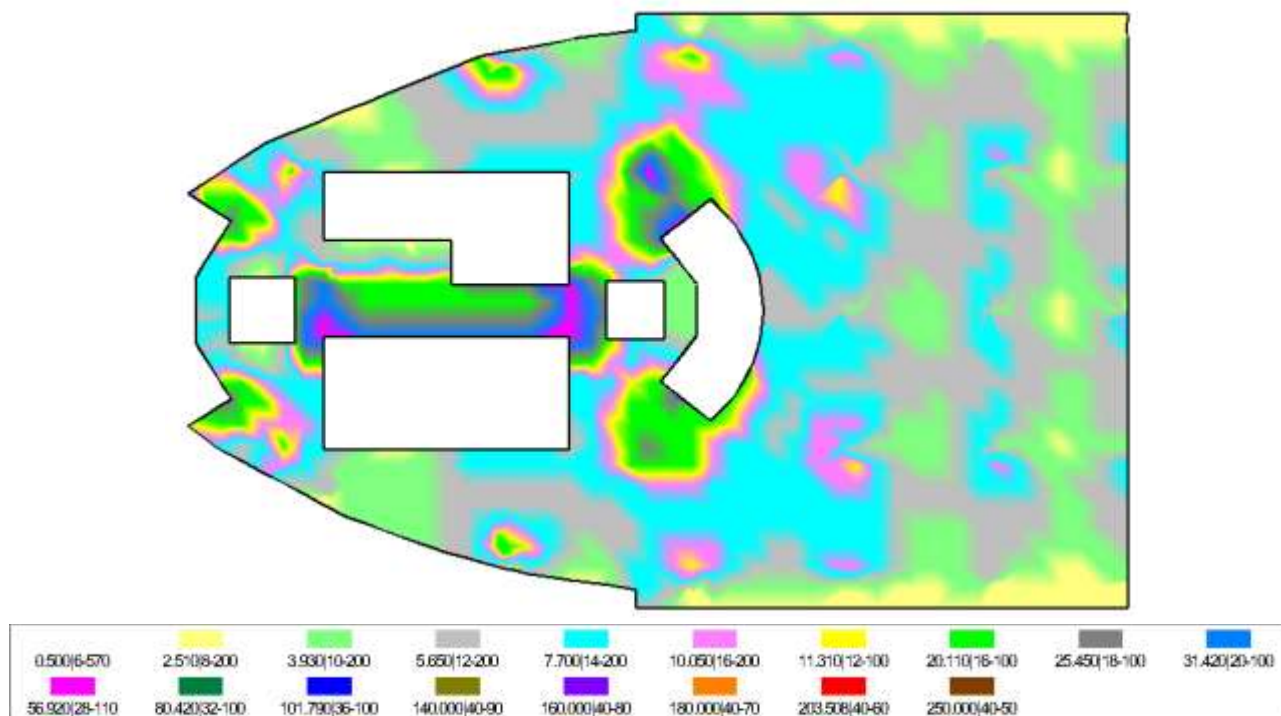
Reinforcement of the floor slab of the eastern tower at +42.80 m. Lower longitudinal reinforcement in the direction of the axis S, cm<sup>2</sup>/m [15]
